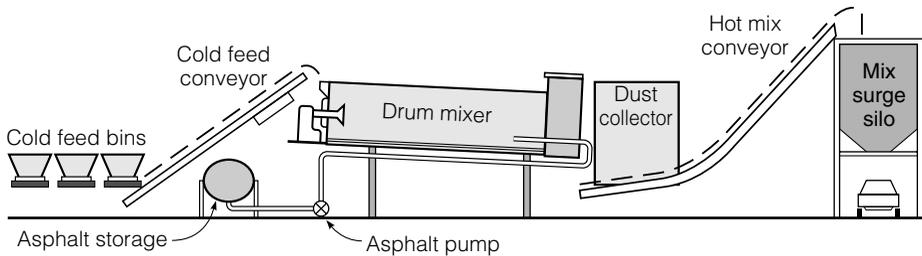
Continuous (drum) mix asphalt concrete plant.
